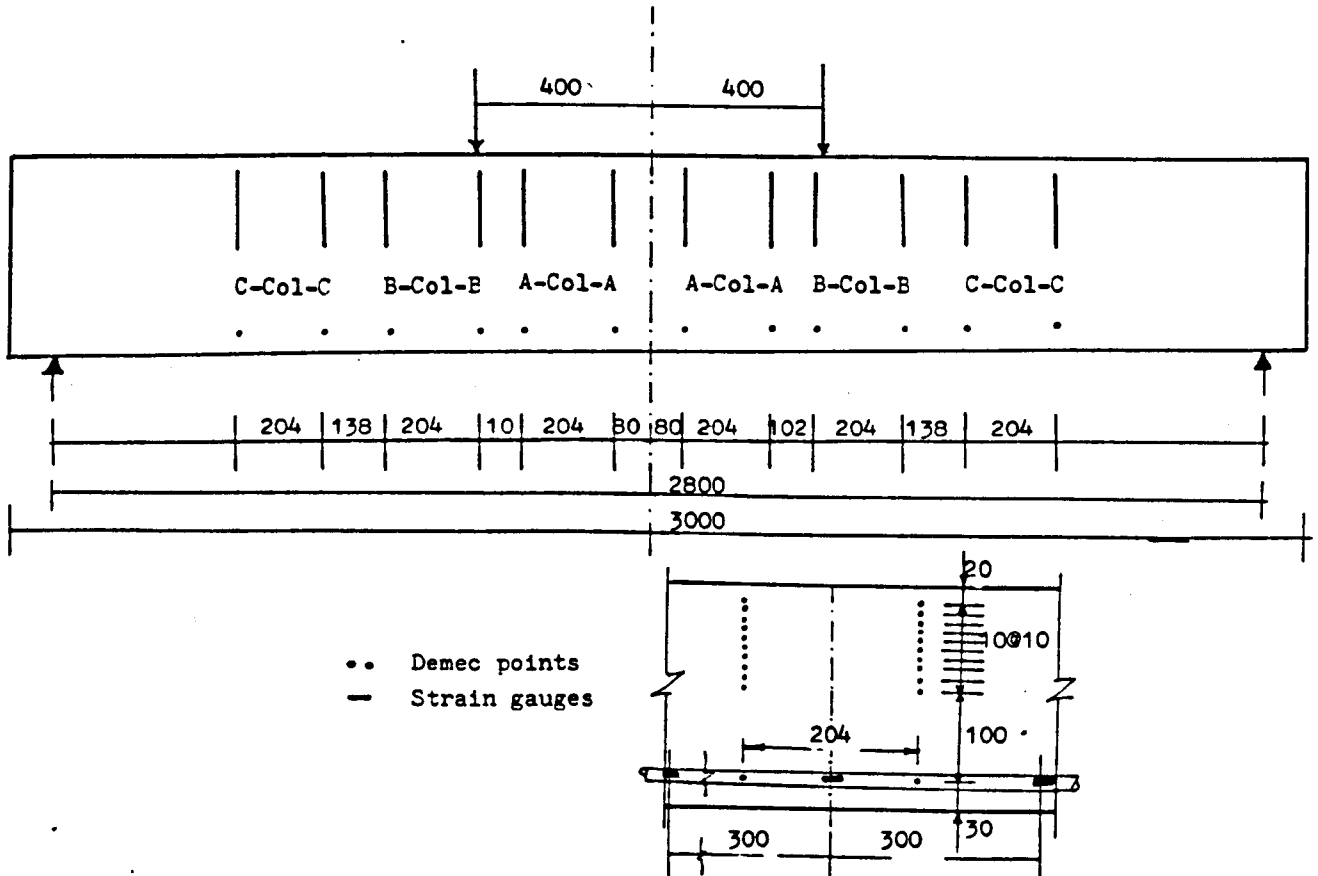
Static tests-unidirectional bending test beam, details and distribution of Demec points column on concrete surface and the relative position of steel strain gauges.
